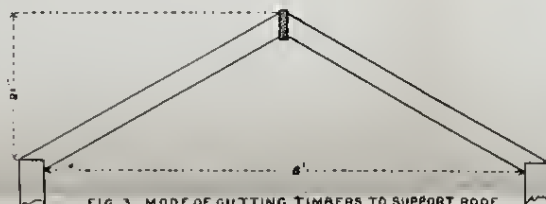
MODE OF CUTTING TIMBERS TO SUPPORT ROOF
